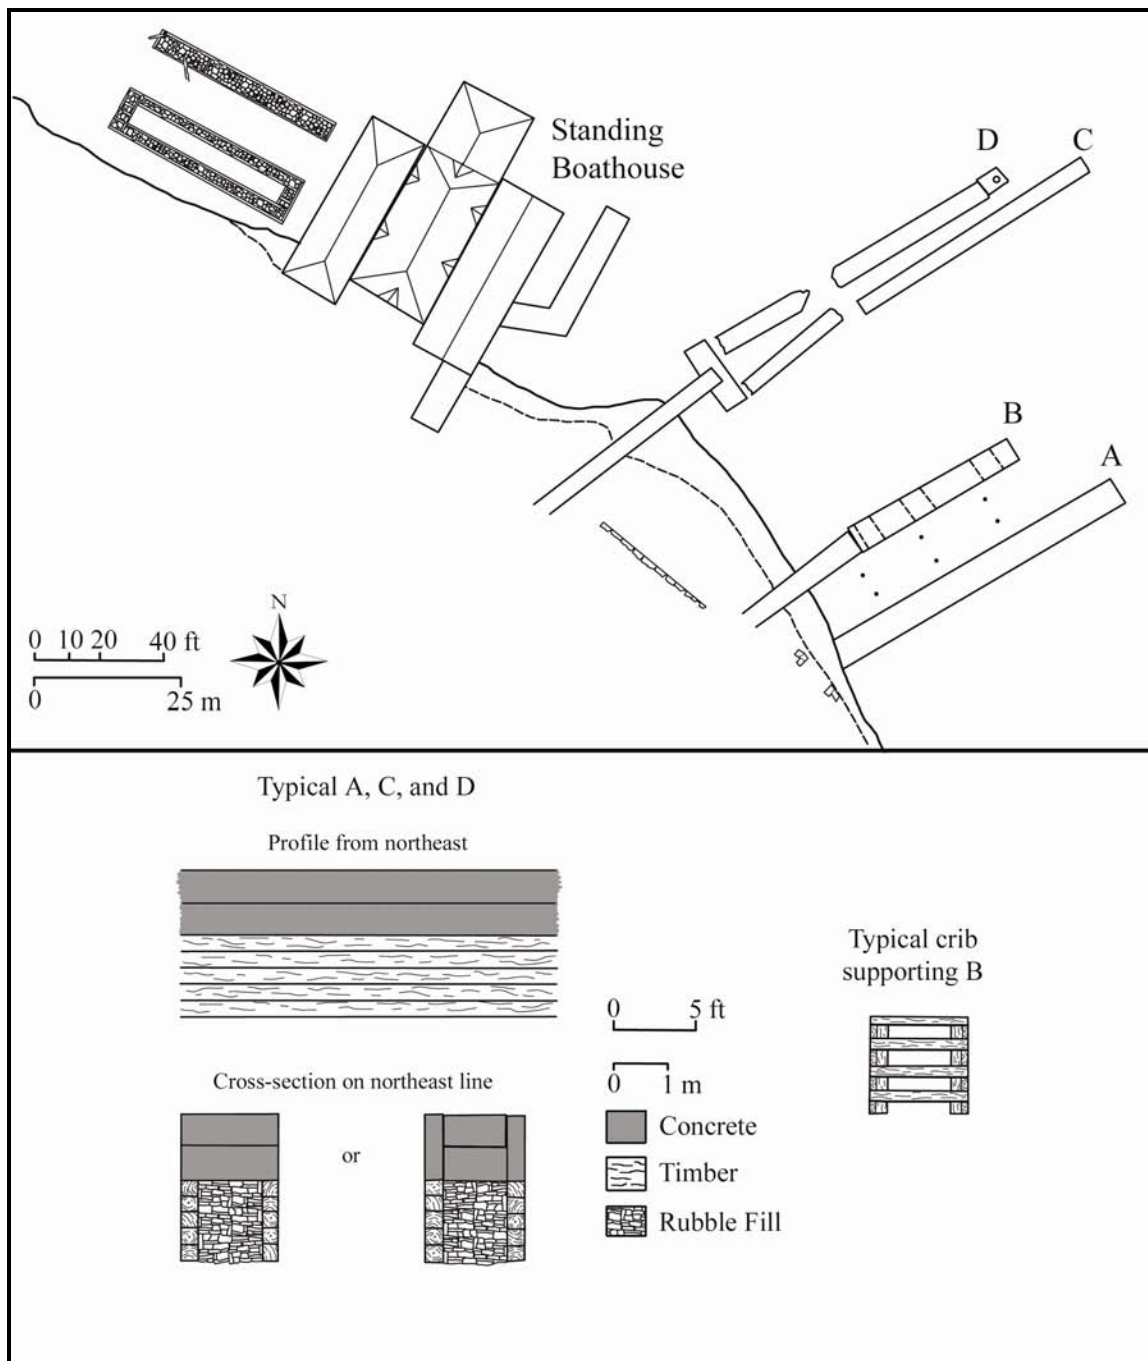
Plan and profiles of Wyckoff boathouse foundations, Carleton Island.
